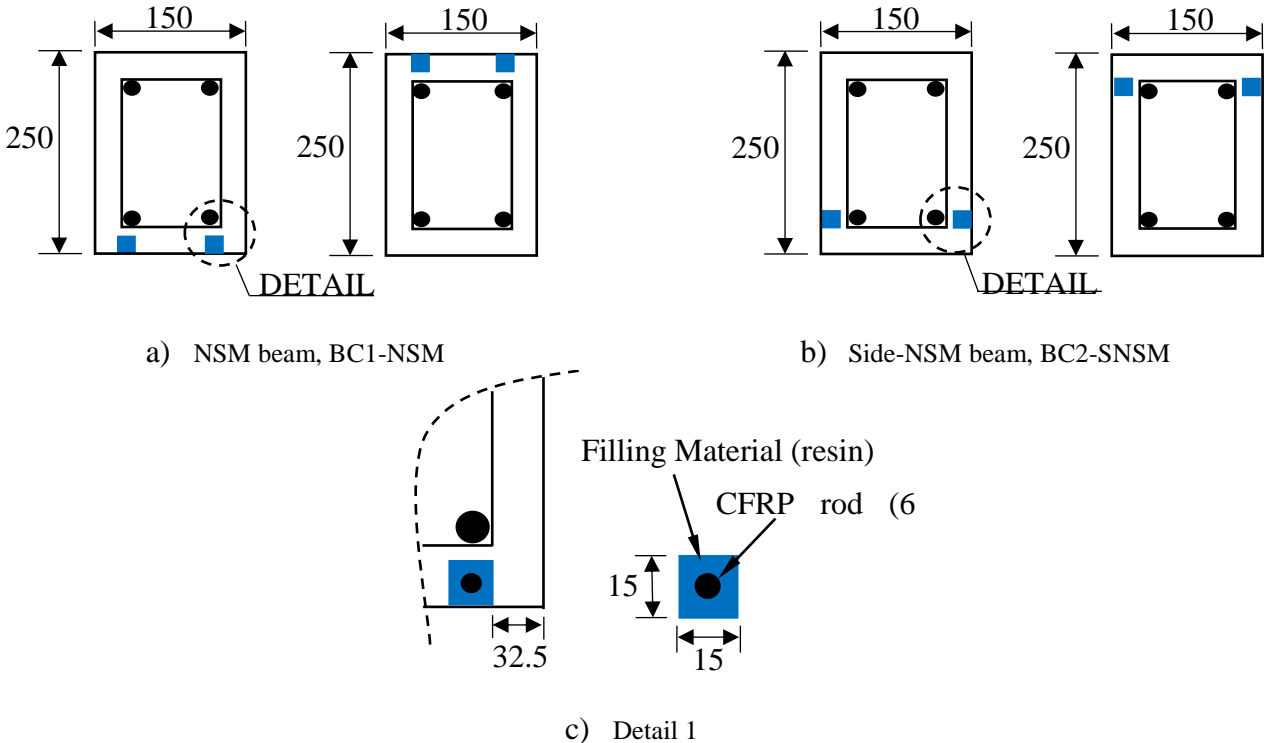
Cross-section and groove dimensions details of NSM beams (All dimensions are in mm).
